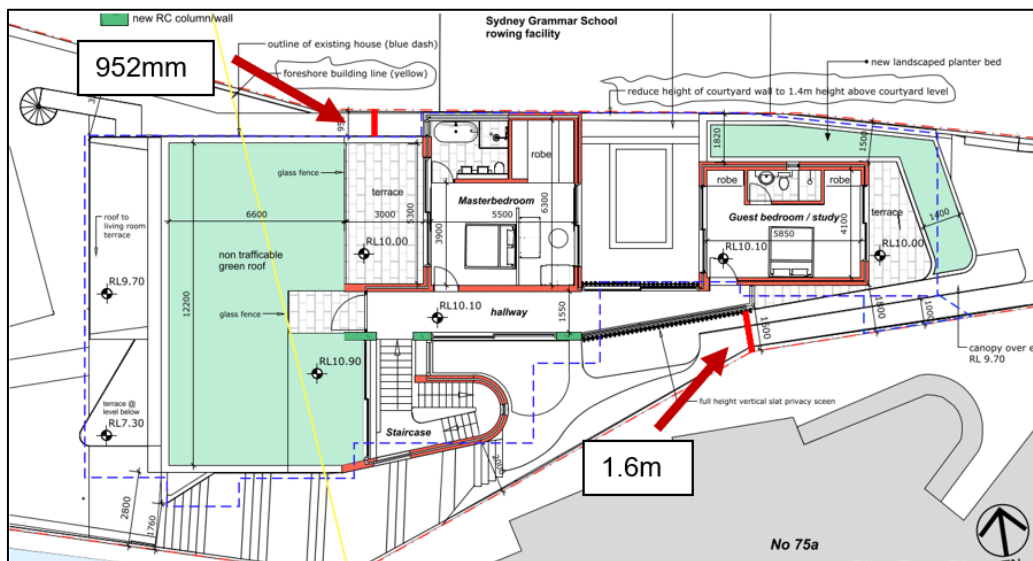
Side setbacks notated on first floor plan (blue dotted line shows outline of existing house)
